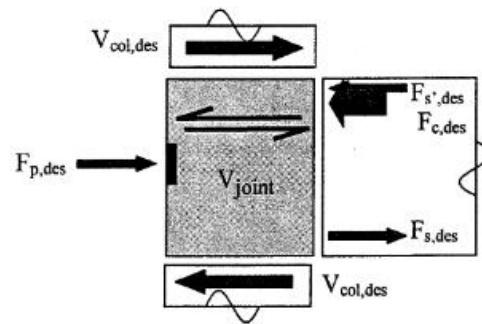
Partially prestressed concrete exterior joint horizontal shear forces [21]
